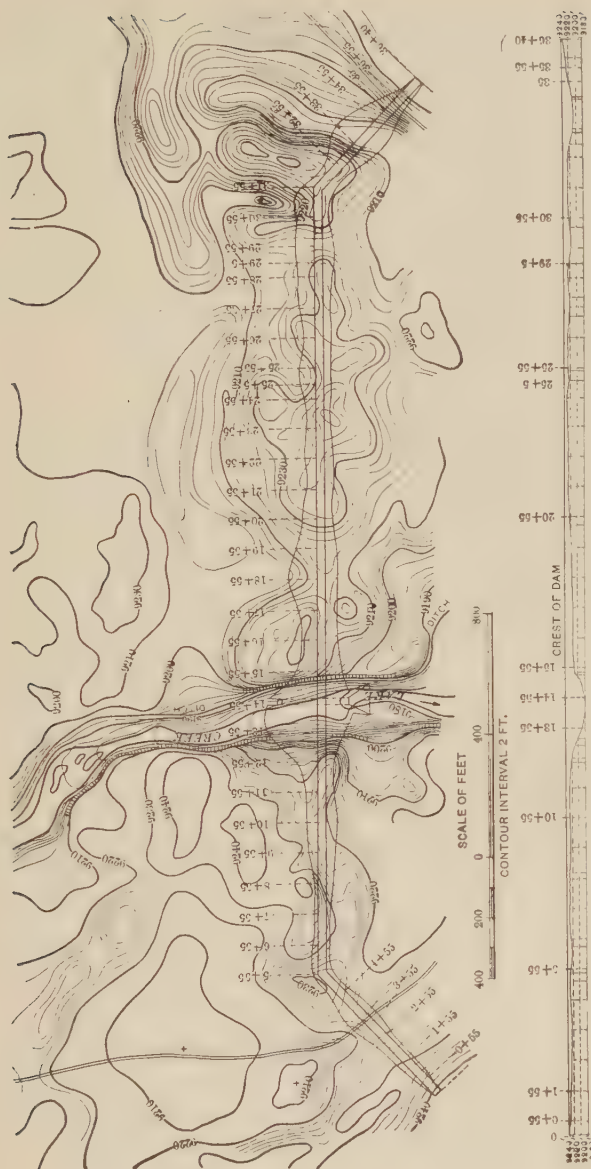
PLAN AND PROFILE OF TWIN LAKES DAM SITE, COLORADO.
